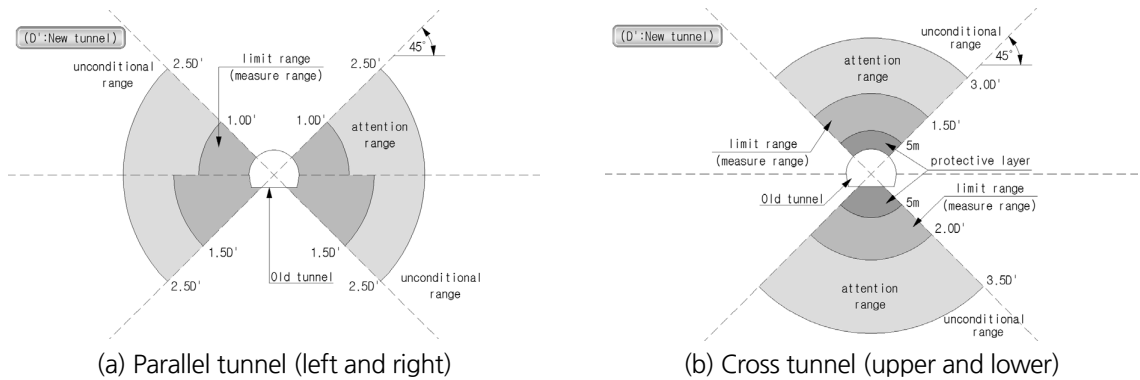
Safety zone induced adjacent excavation in existing and new tunnel
